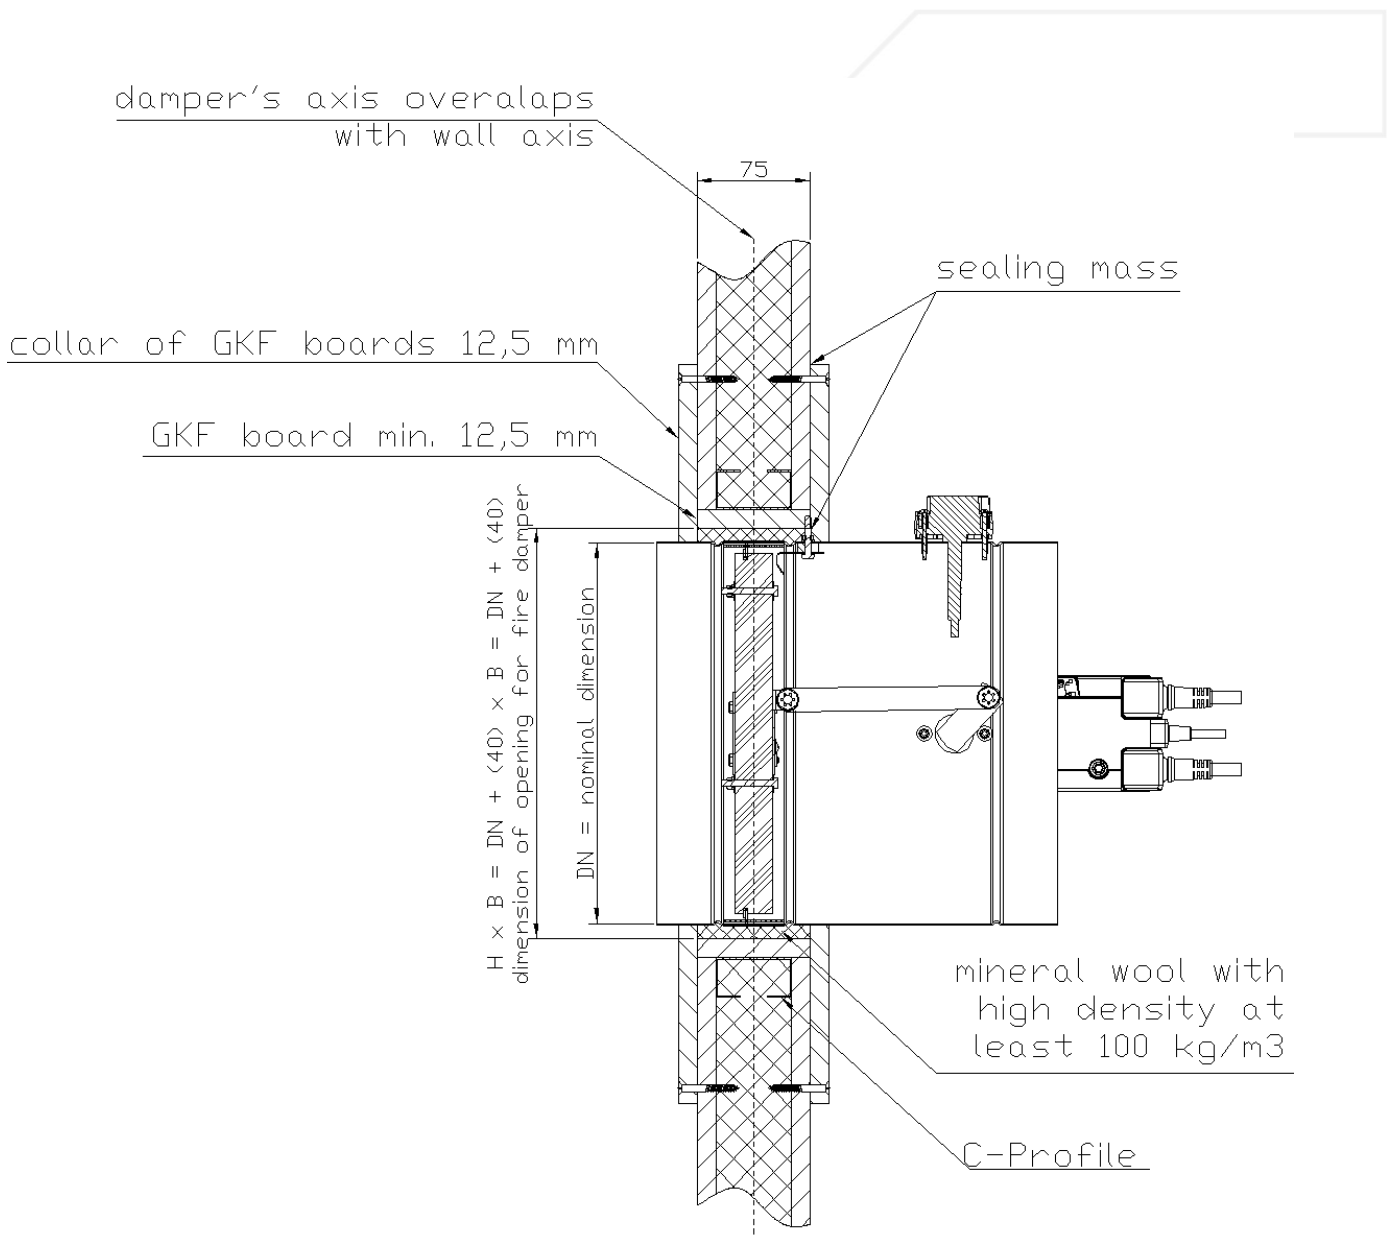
Installation method of fire dampers KTM-O in flexible wall with 75 mm thickness
